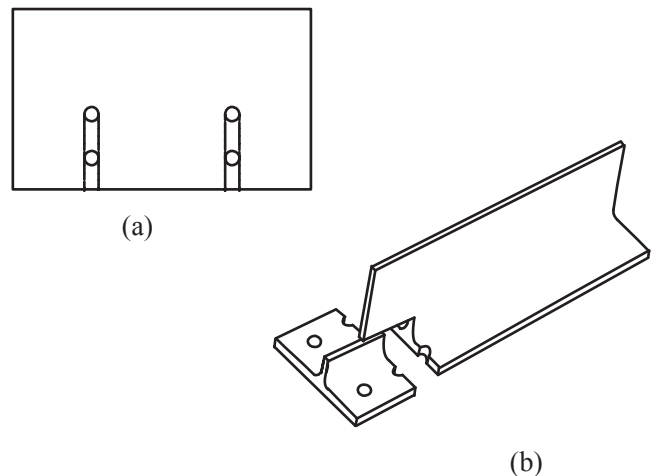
Failure paths considered: (a) bolt tear-out; (b) alternate block shear path in tees.
